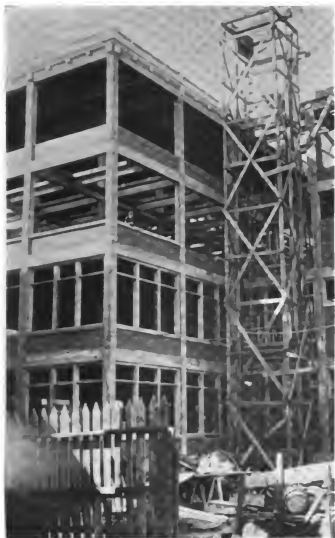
EXTERIOR VIEW OF BUILDING DURING CONSTRUCTION.
